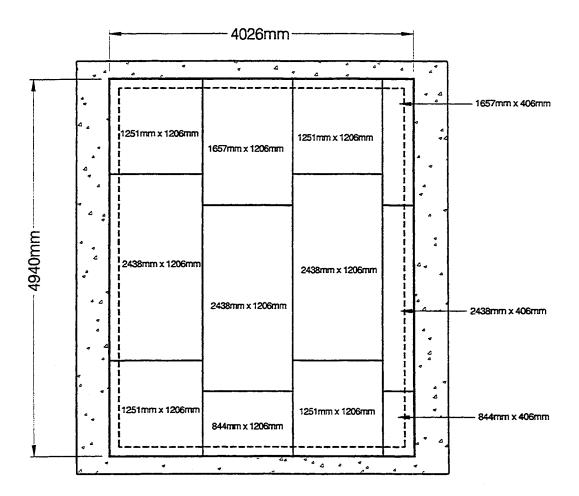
Single layer or base subfloor layout, joists 406 mm o.c.
